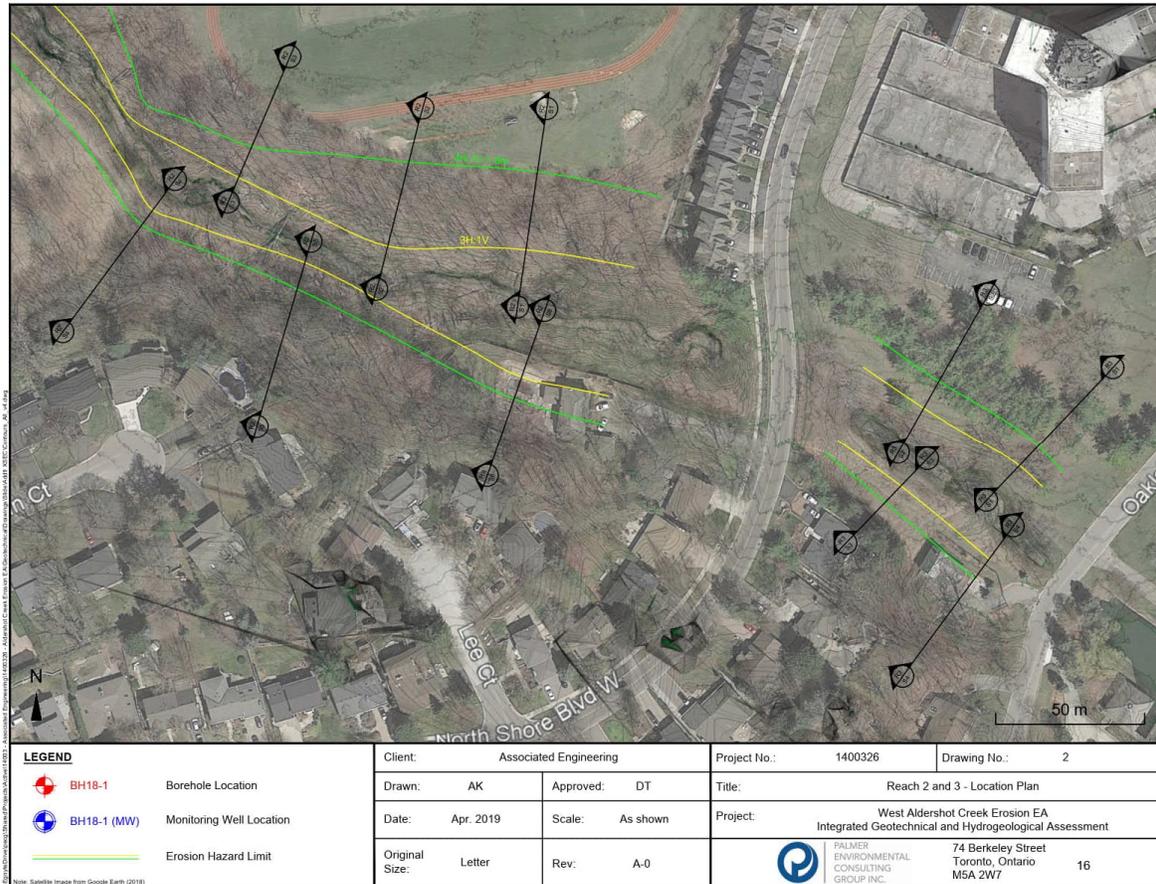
Borehole and Monitoring Well Location Plan (Part 2)
